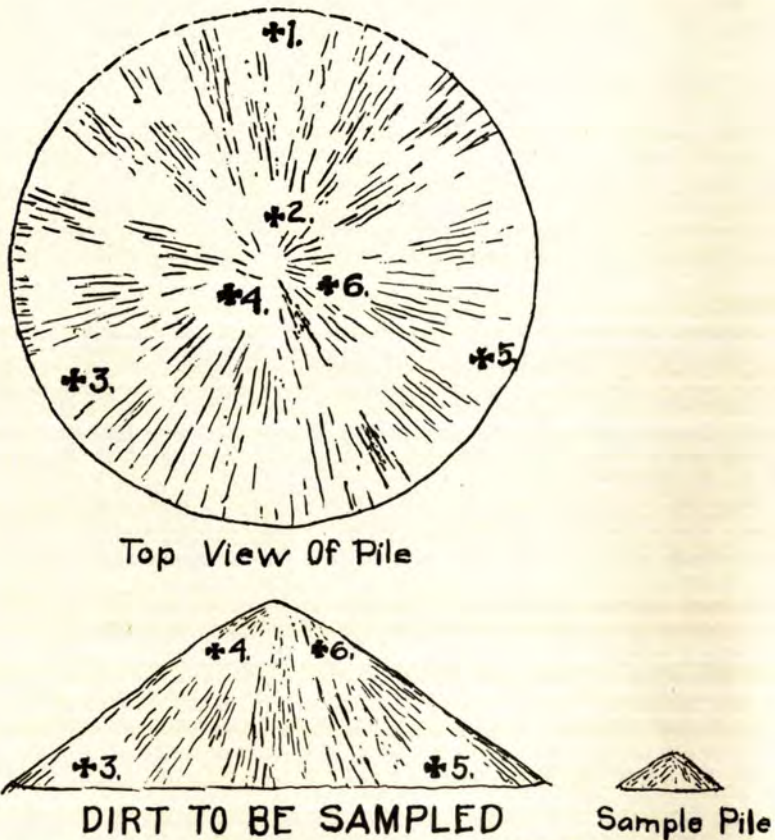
METHOD USED FOR SAMPLING A PILE OF DIRT TO BE USED FOR EARTH WALLS
